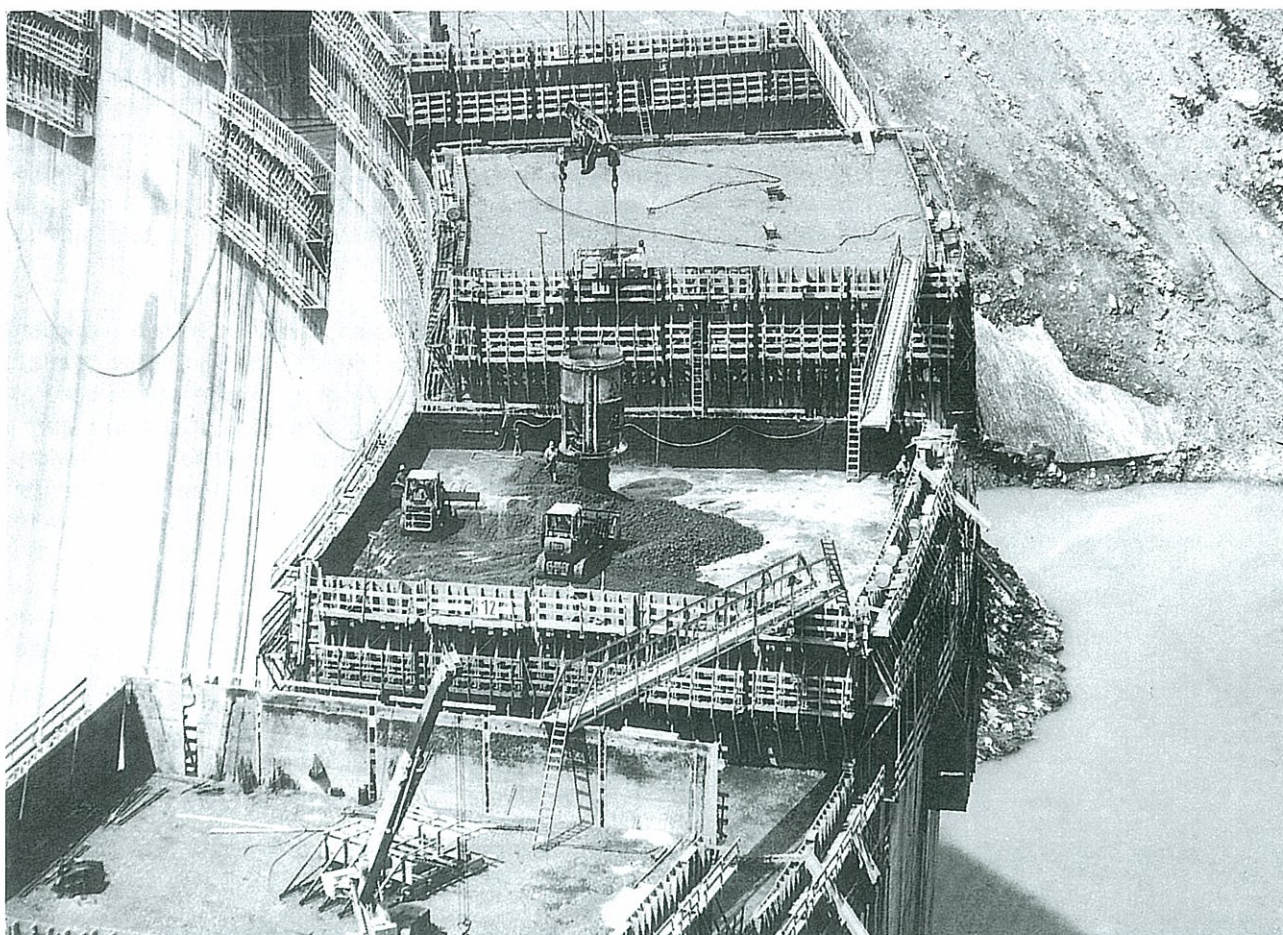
Concrete placement at Zillergründl dam by vibrating and spreading crawlers in 1983
